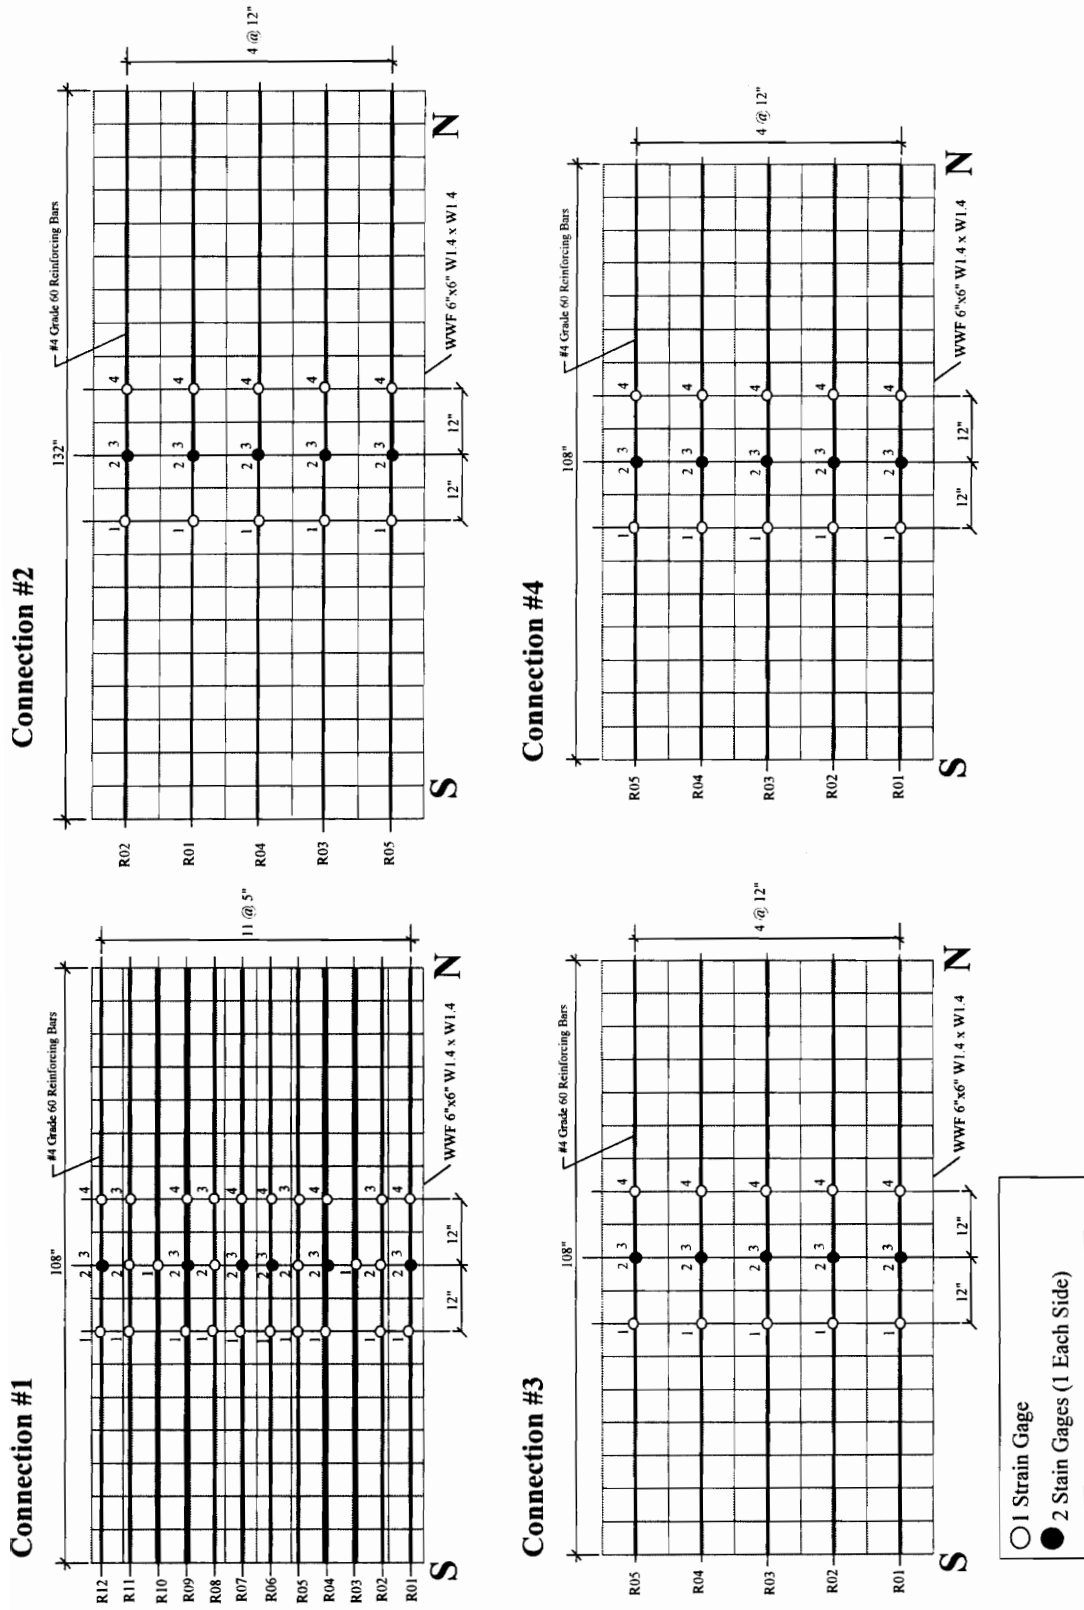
Reinforcing Bar, Mesh Layout/Instrumentation
